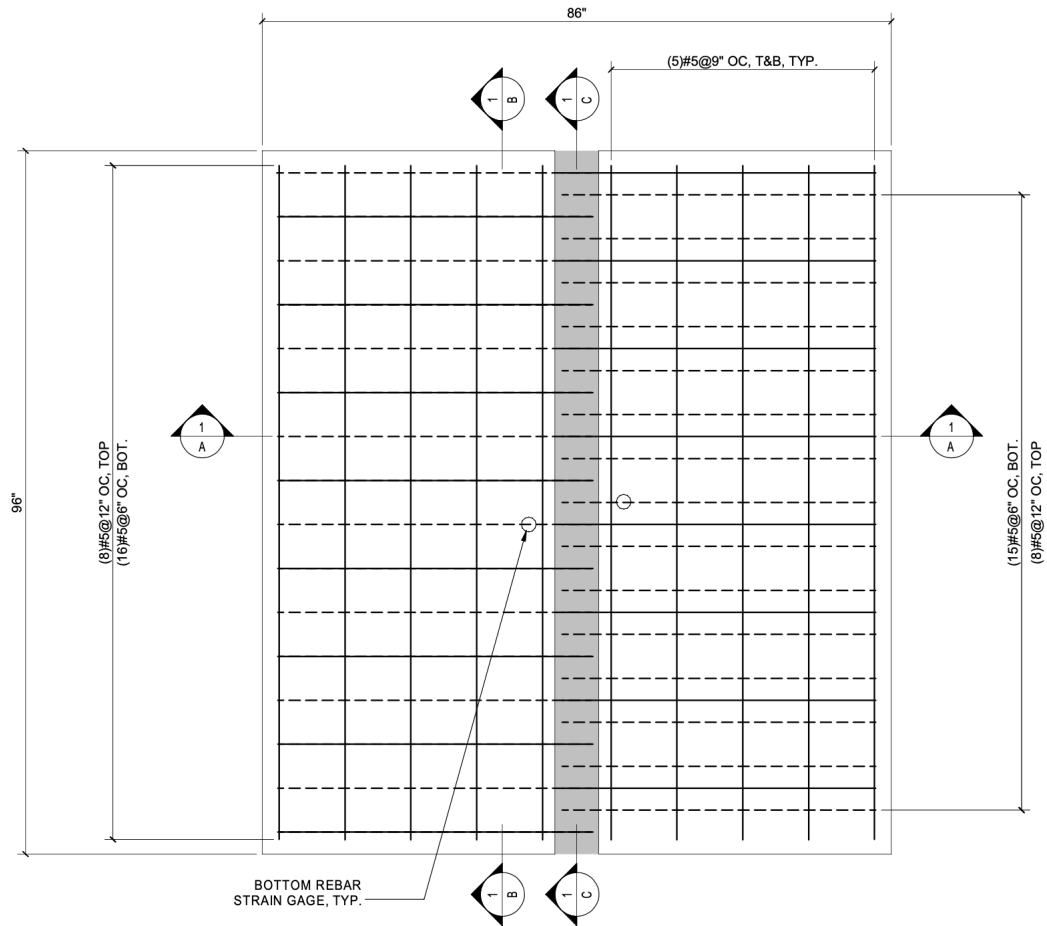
Plan view of a structural test specimen (2) 40 in. by 96 in. panels.
